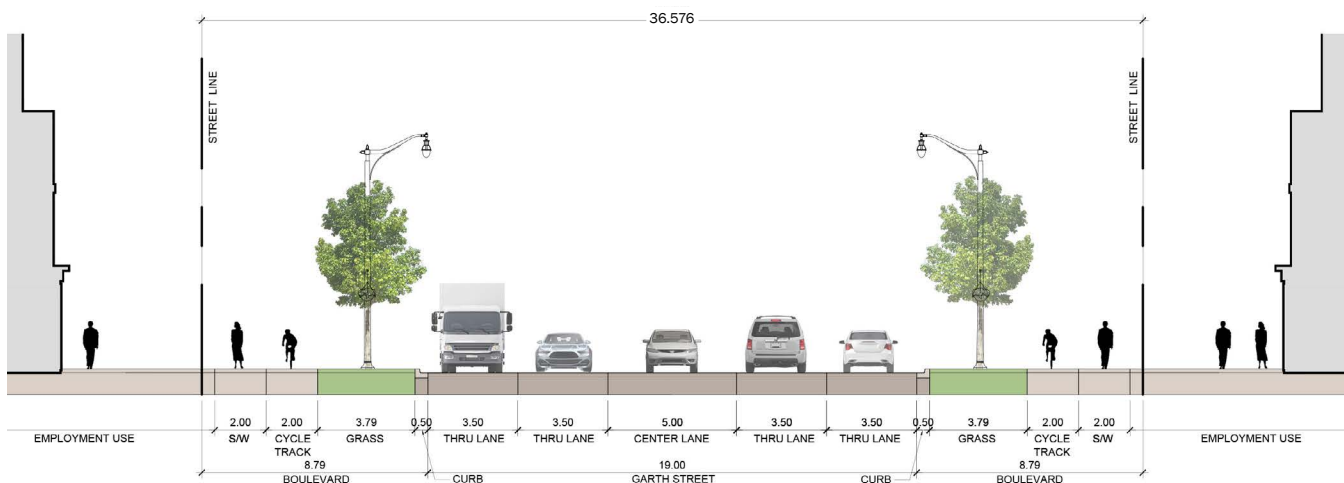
Garth Street Minor Arterial Road (Street "A") Cross Section through Employment Area.
